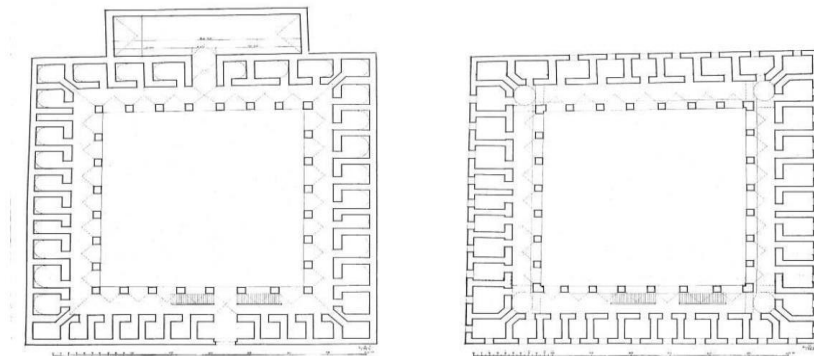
The layout of Emir khan the ground floor and first floor (SAĞLIK 2016.: 62)
